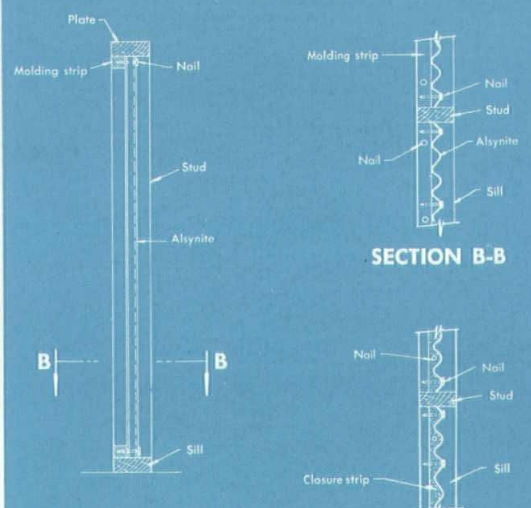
DETAIL THROUGH WALL WHERE ALSYNITE IS APPLIED TO OUTSIDE OF FRAMING
